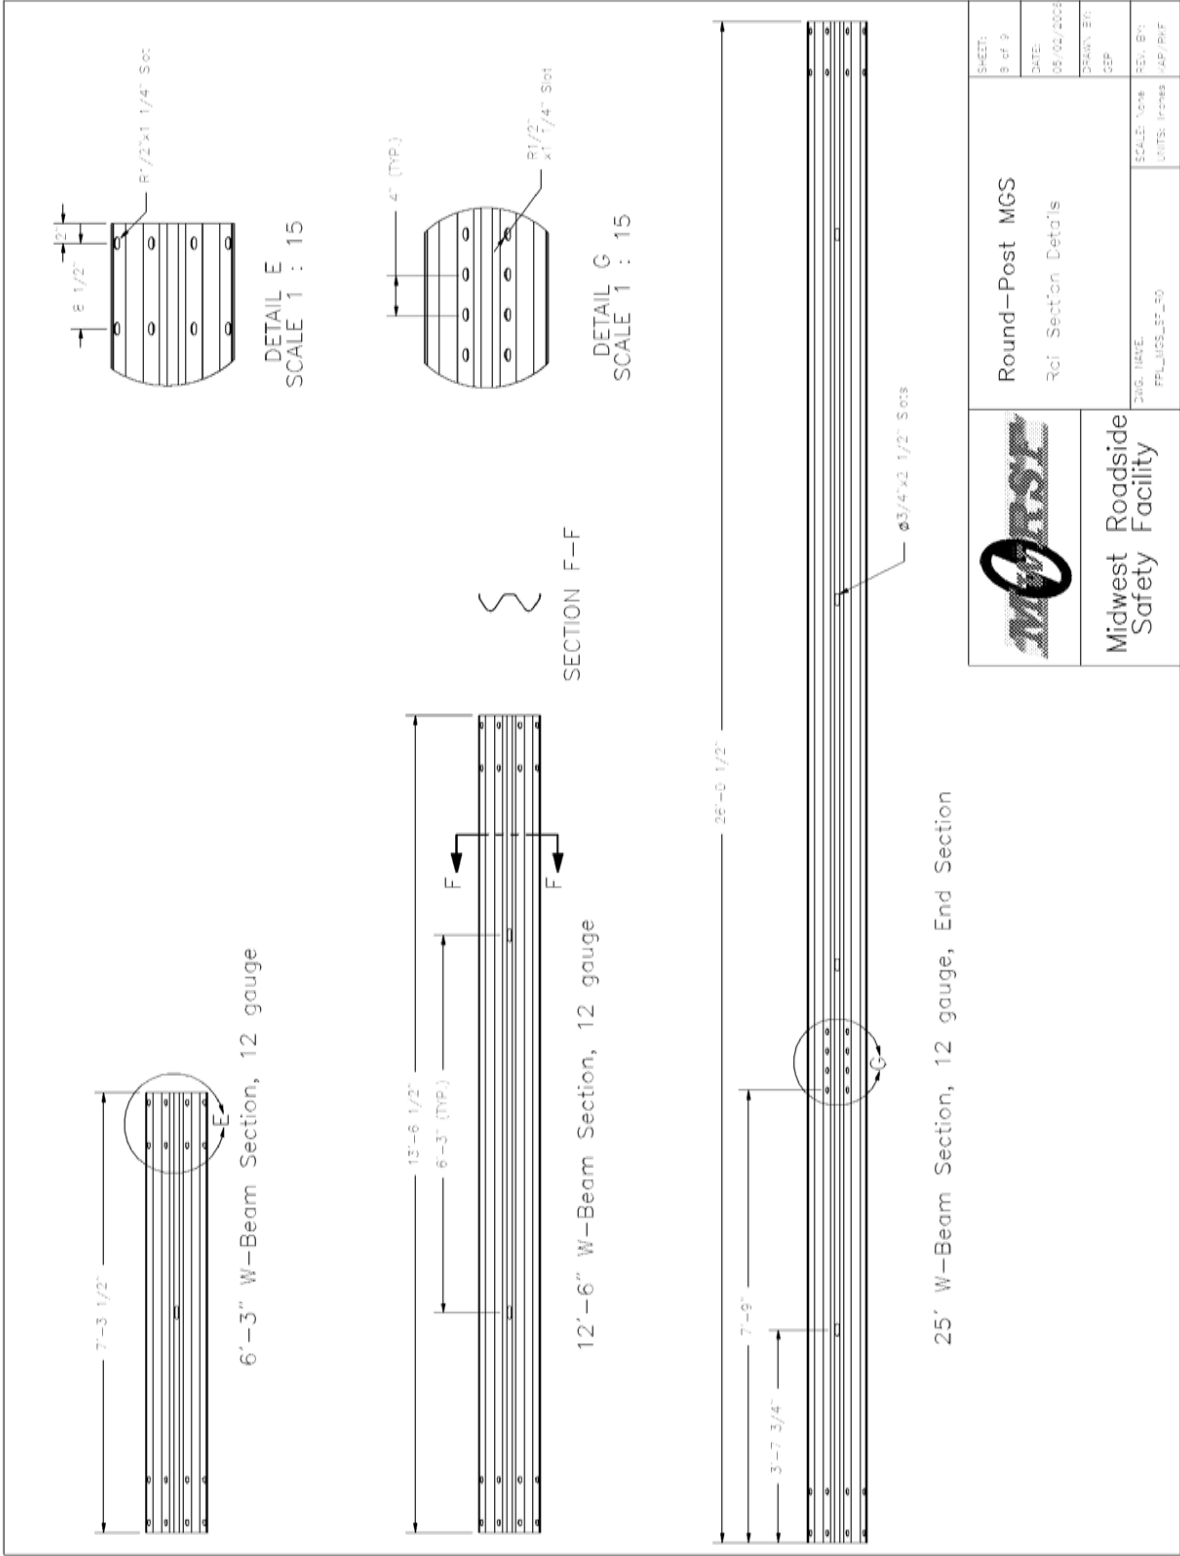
MGS Round Post Southern Pine English Details – Rail Section Detail
